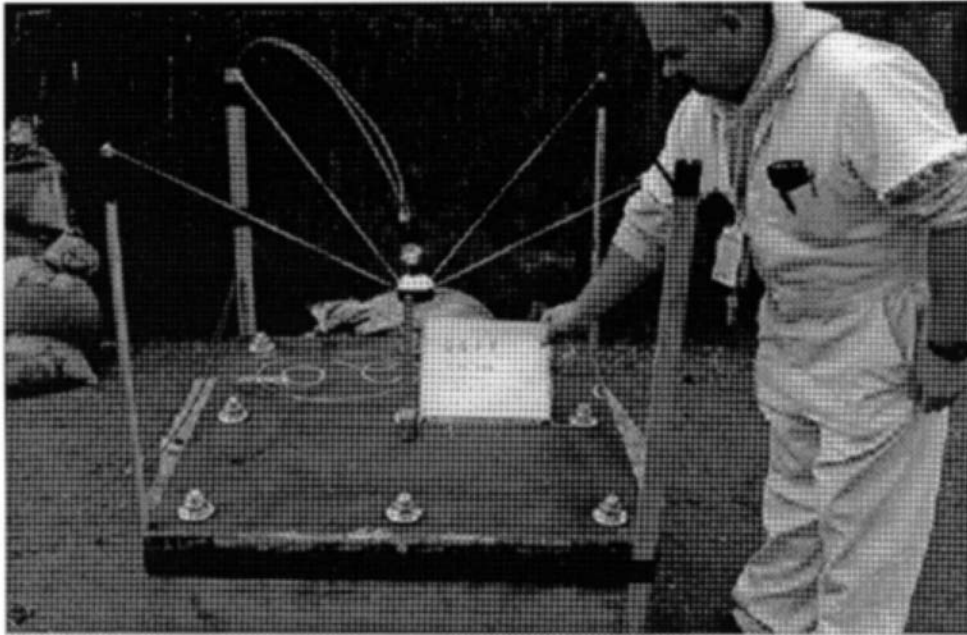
Completed 1/4-scale floor section prior to testing at the 25% explosive weight level.
